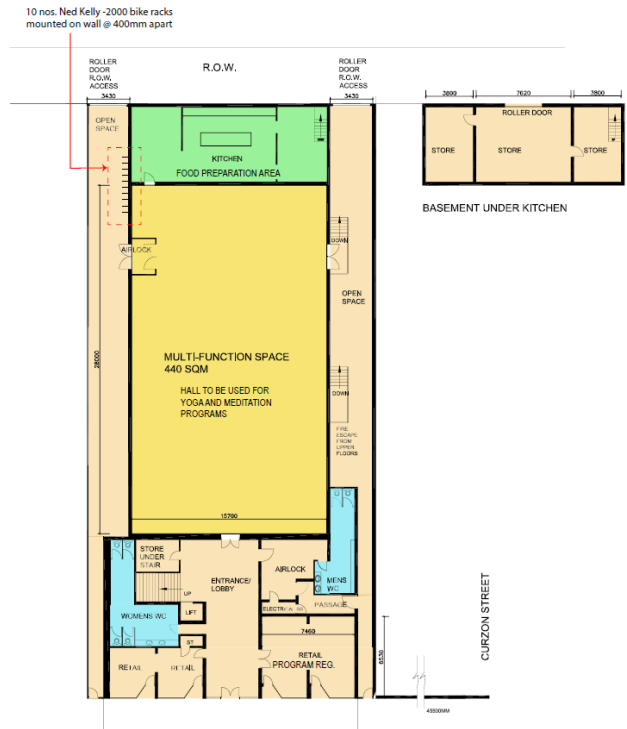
Proposed ground floor plan (Source: Glossop Town Planning Report April 2019).
